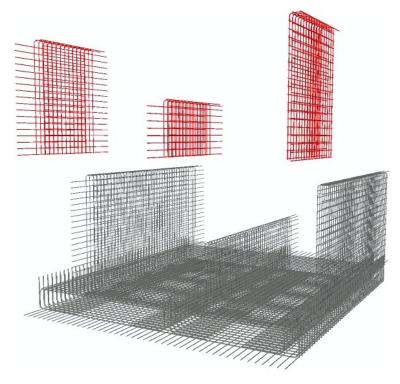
Installation of prefabricated reinforcement cages for the walls (SketchUp).
